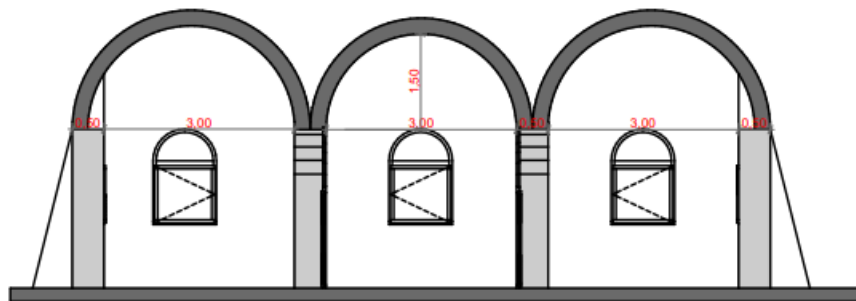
Cross section of the arched frames showing the vaulted roof of the model
